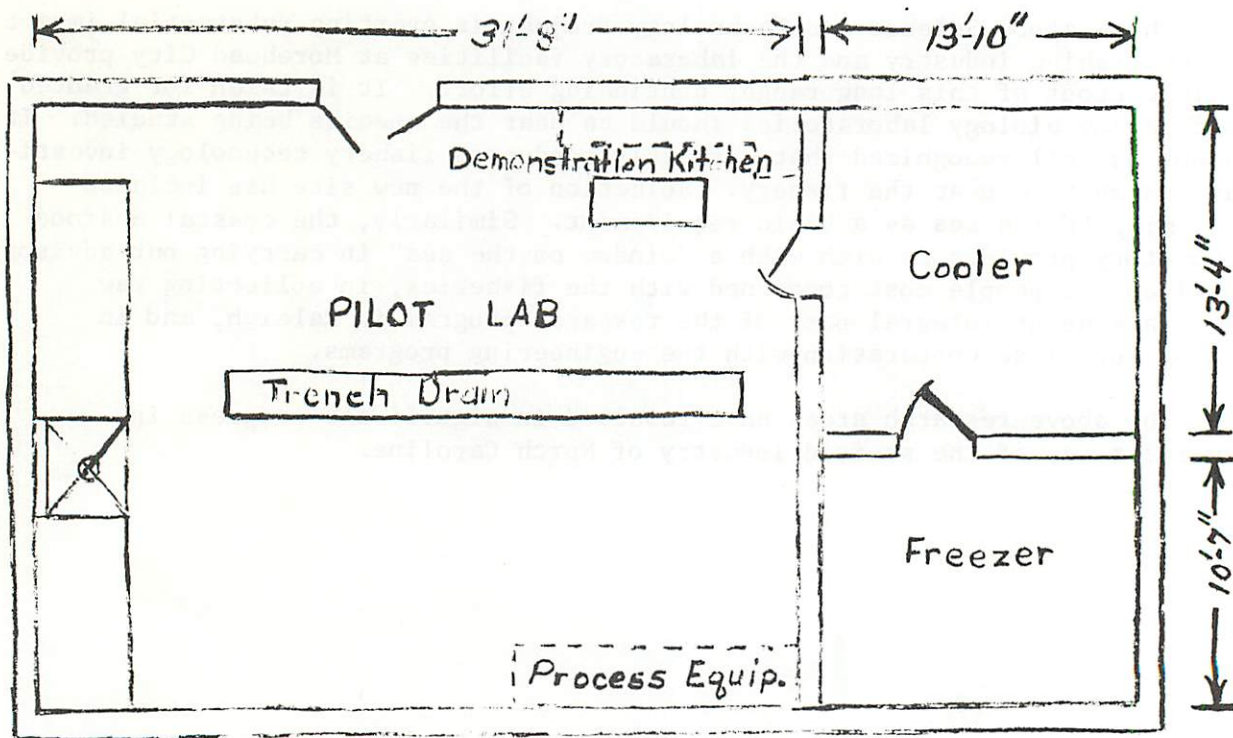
Pilot Laboratory, Cold Storage and Freezer Layout, 1st Floor
